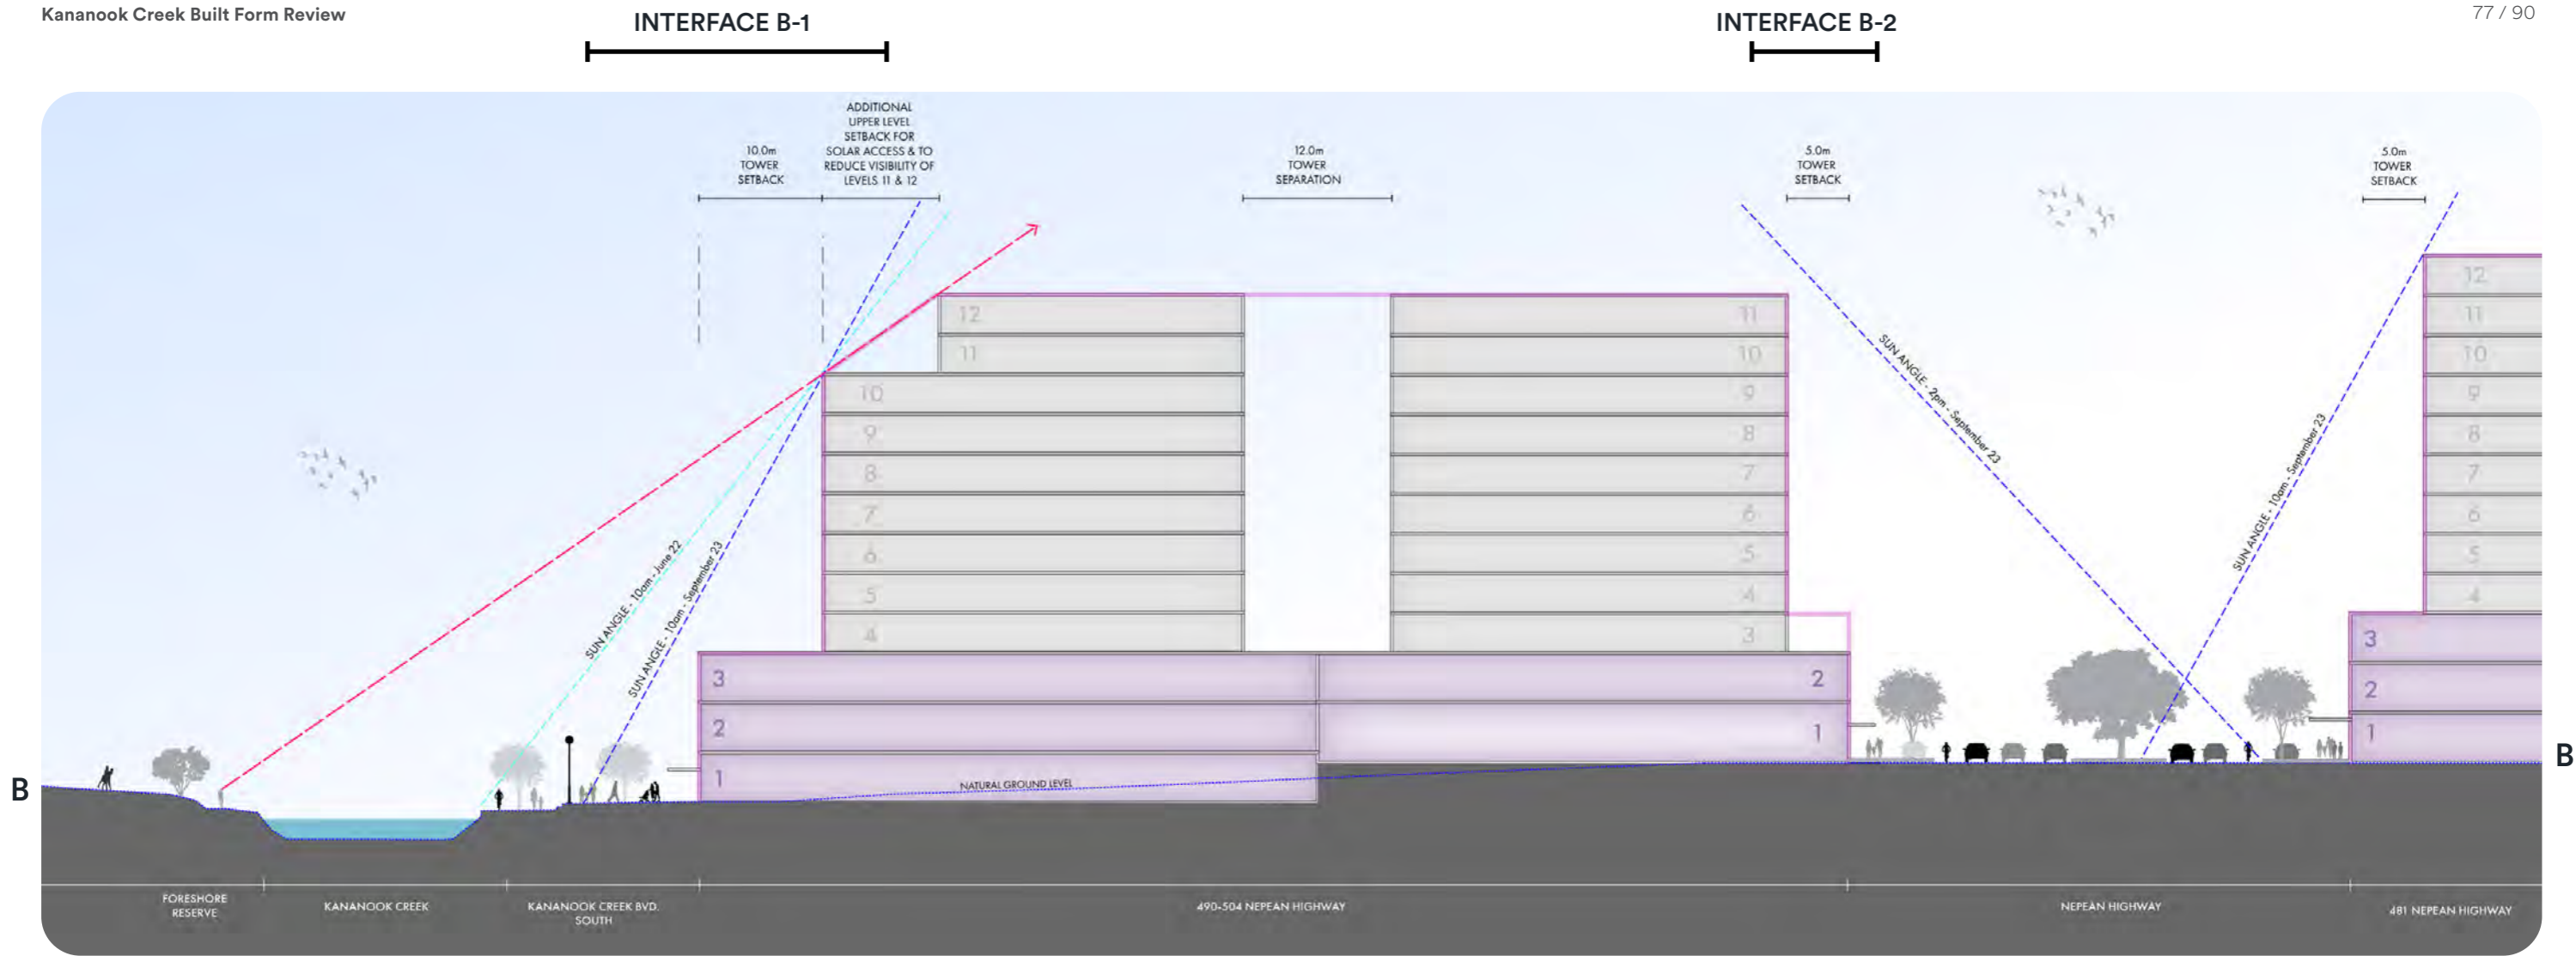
Built Form Recommendations Plan - Sub-Precinct B
